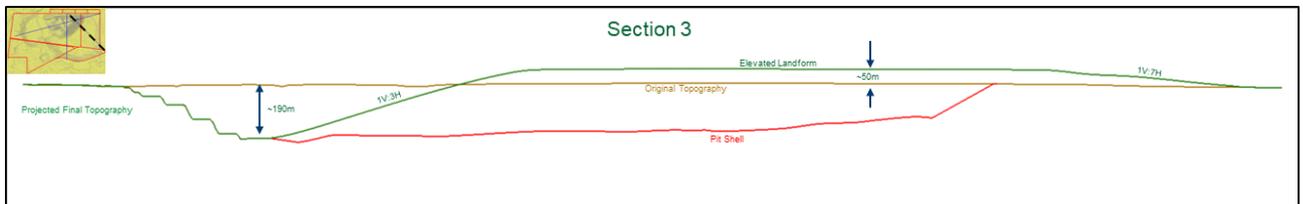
Section 3 – Partially backfilled pit and elevated waste dump
